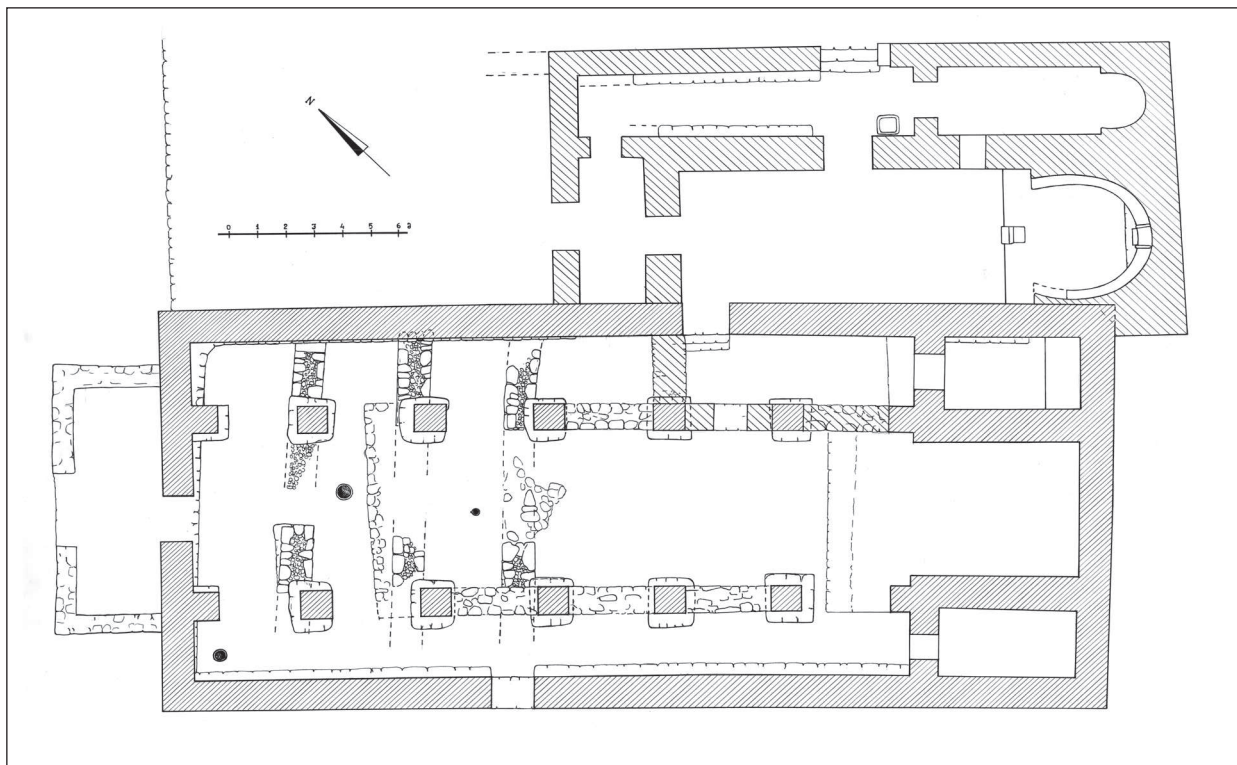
The plan of the Chabukauri Basilica and adjoining church (showing excavated remains of the Pagan church)
